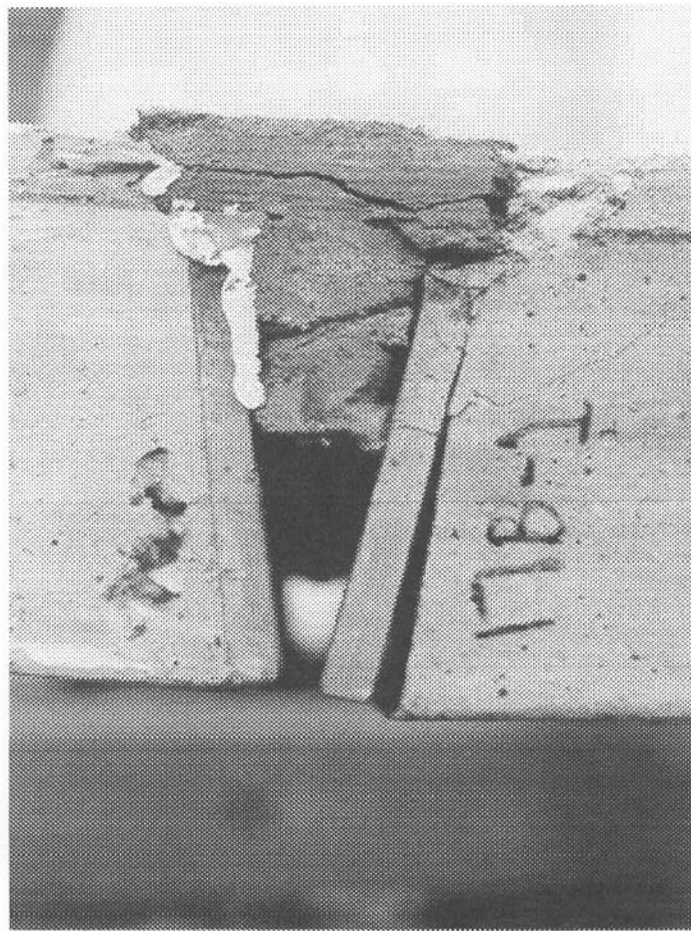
Pull-Out of Weld Plate in Beam Connection Test
